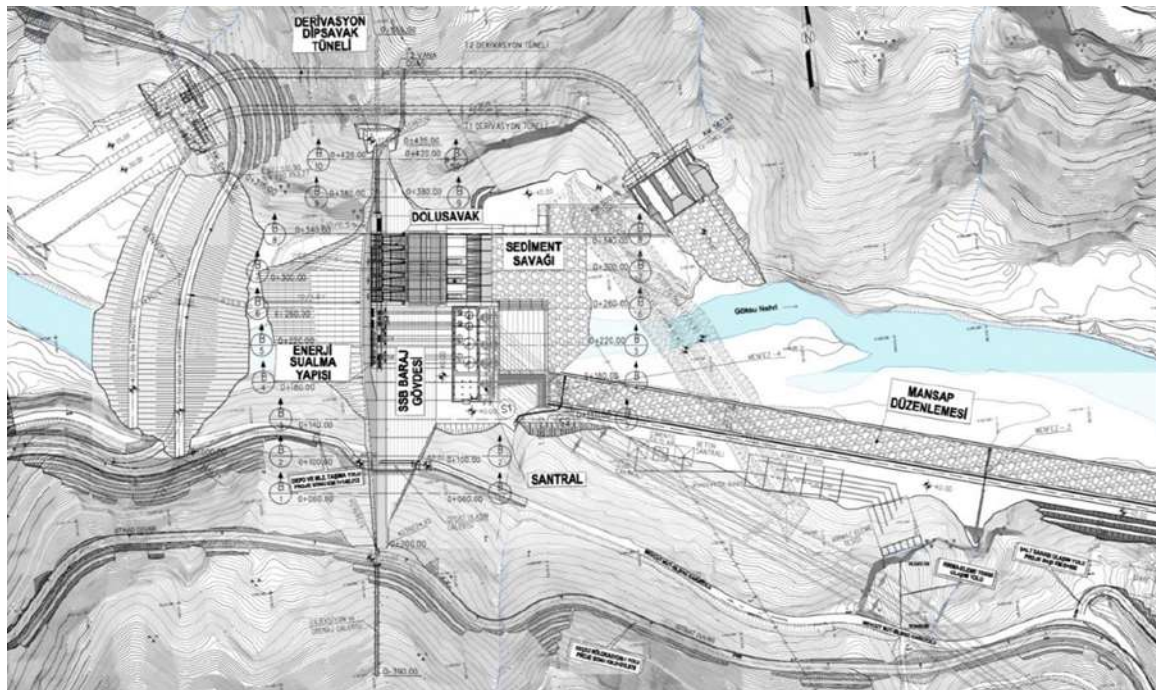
General Layout of Kayraktepe Dam Facilities [Koyuncu and Poyraz, 2017]
